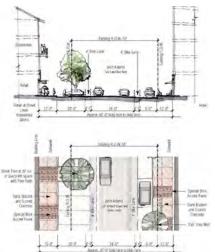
Street section: 2 lanes traffic, 2 bike lanes, head-in and parallel parking (Source: JHP, 2009)
